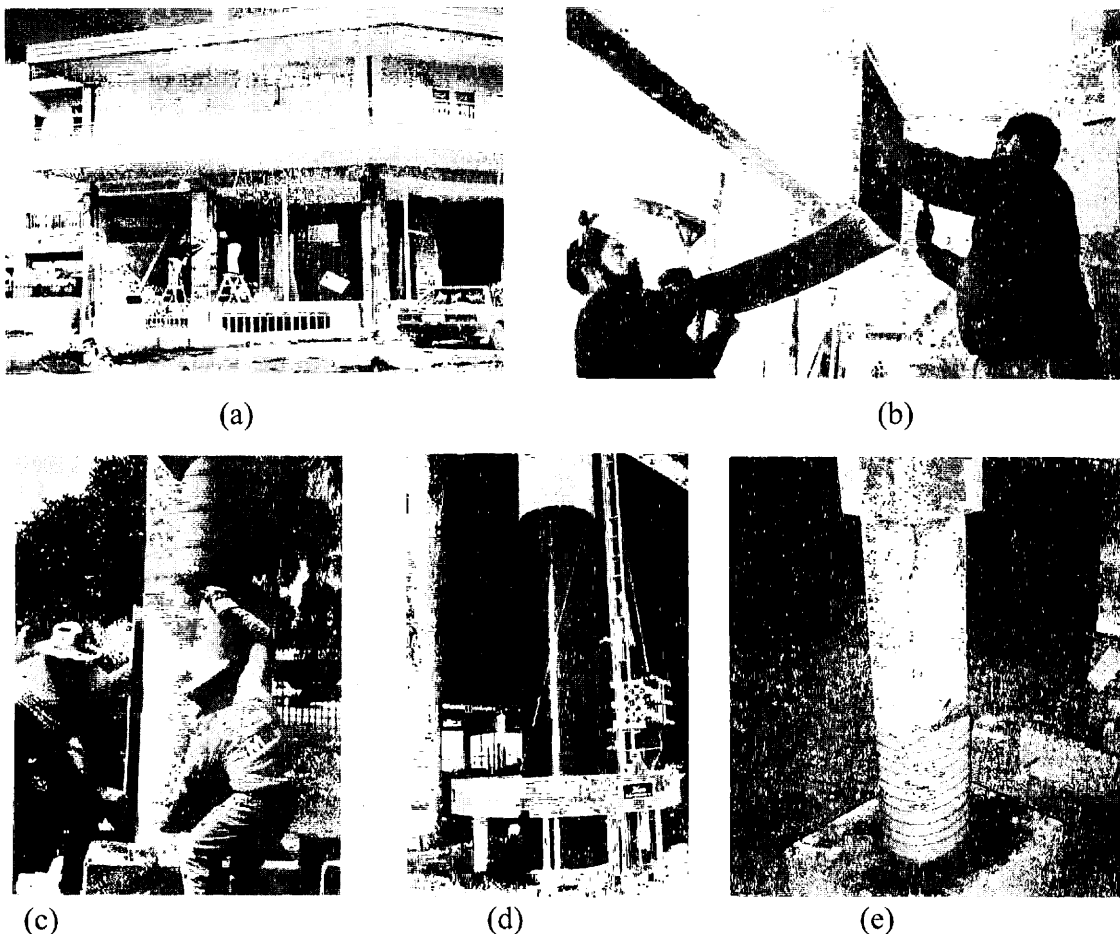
Retrofitting with: (a) and (b) FRP sheets; (c) prefabricated shells; (d) automated wrapping; (e) prestressed FRP jackets through the use of expansive mortar.
